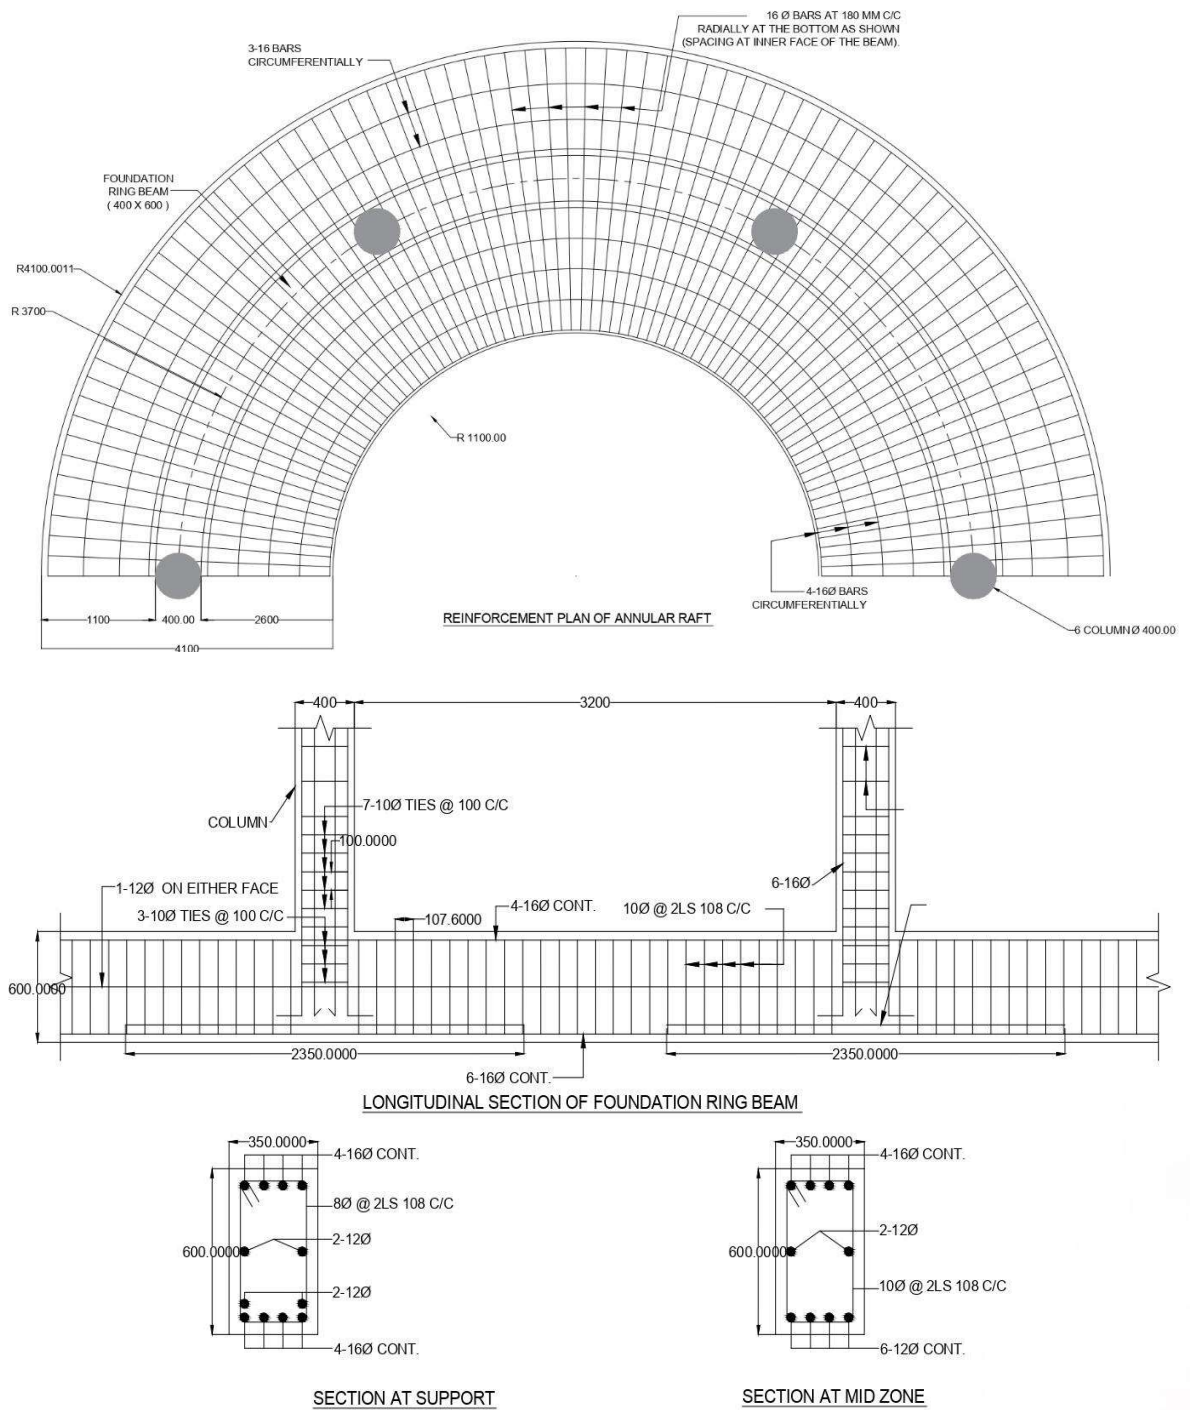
Reinforcement plan of foundation ring beam and raft of hybrid circular tank
